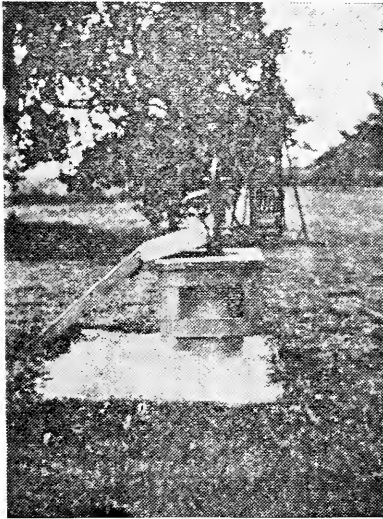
Dug well properly protected. Notice pump and terra-cotta curbing surrounded by base of concrete.
